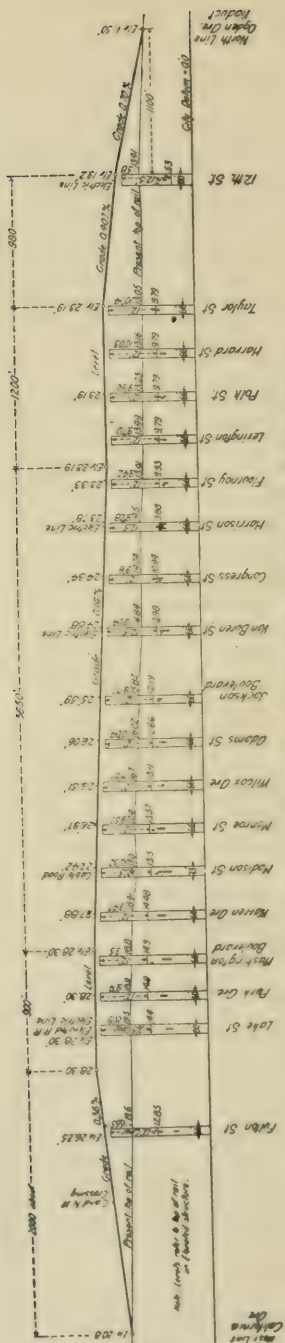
PROFILE OF THE ROCKWELL STREET ELEVATION.
